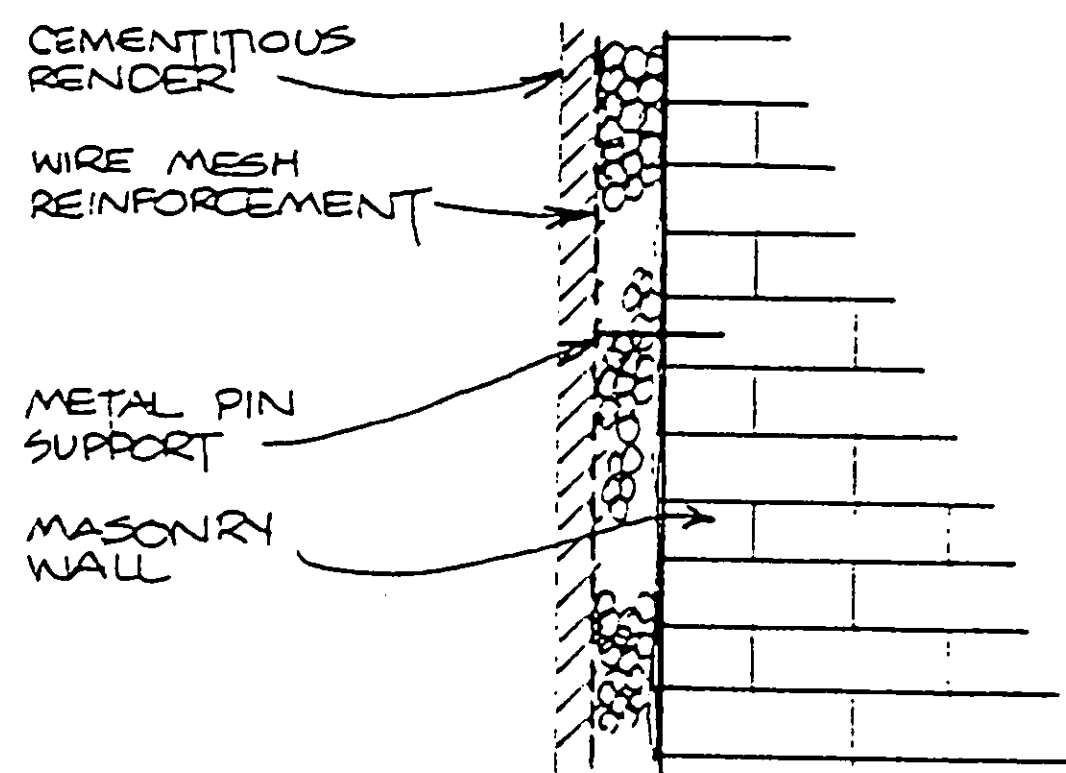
INSULATION SANDWICHED BETWEEN WALL AND RENDERING
